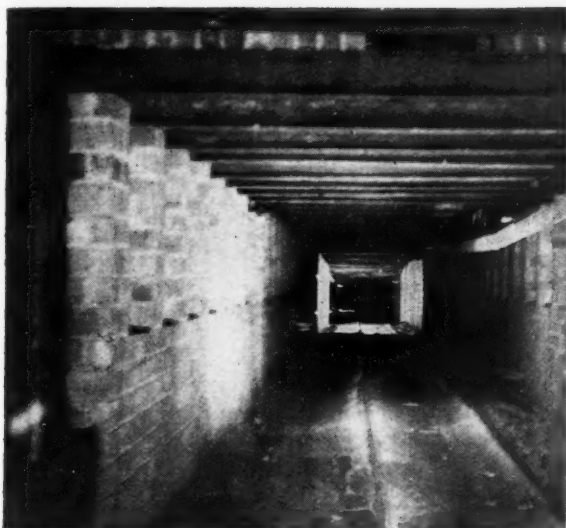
(above)—Nemacolin mine: roof supports, showing brick and pipe columns built for comparing costs—looking outby from south loaded track.
